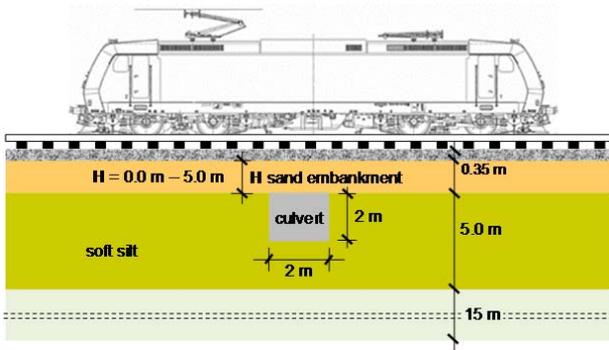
Longitudinal view of the track passing over the culvert (not to scale)
